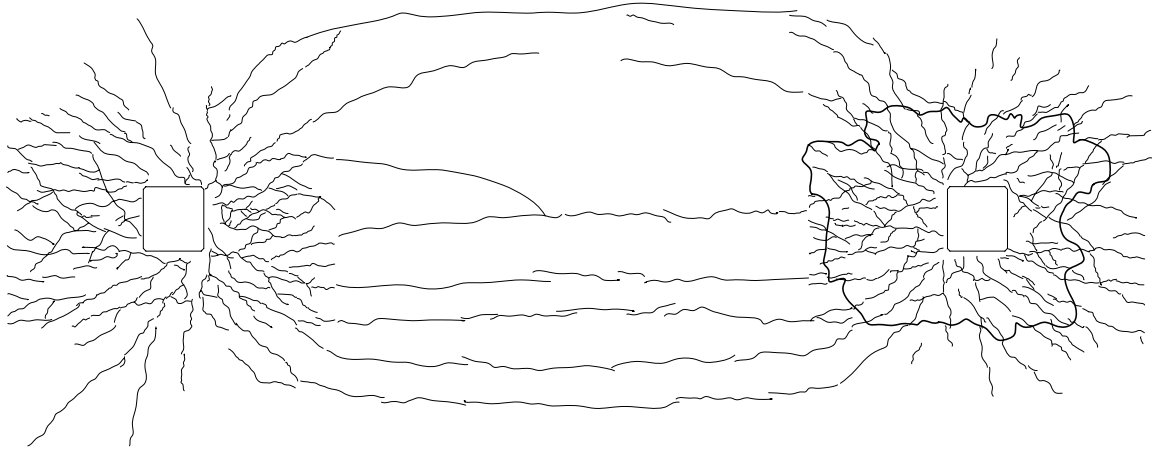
Level 3-2A and 2B Top Slab Cracks (South 3% Roof Drift)
